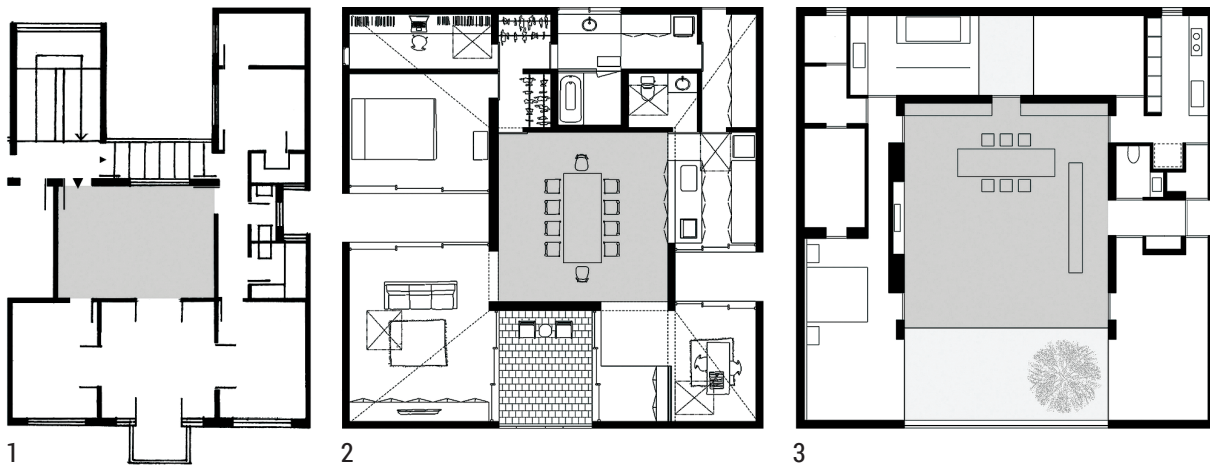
The motif of a multipurpose space as a core: 1) Typical "salon" apartment, Belgrade; 2) House Yagiyama, Sendai, Kazuya Saito Architects, 2012; 3) Library House, Tochigi, Shinichi Ogawa, 2012 (Source: Authors' archive)
